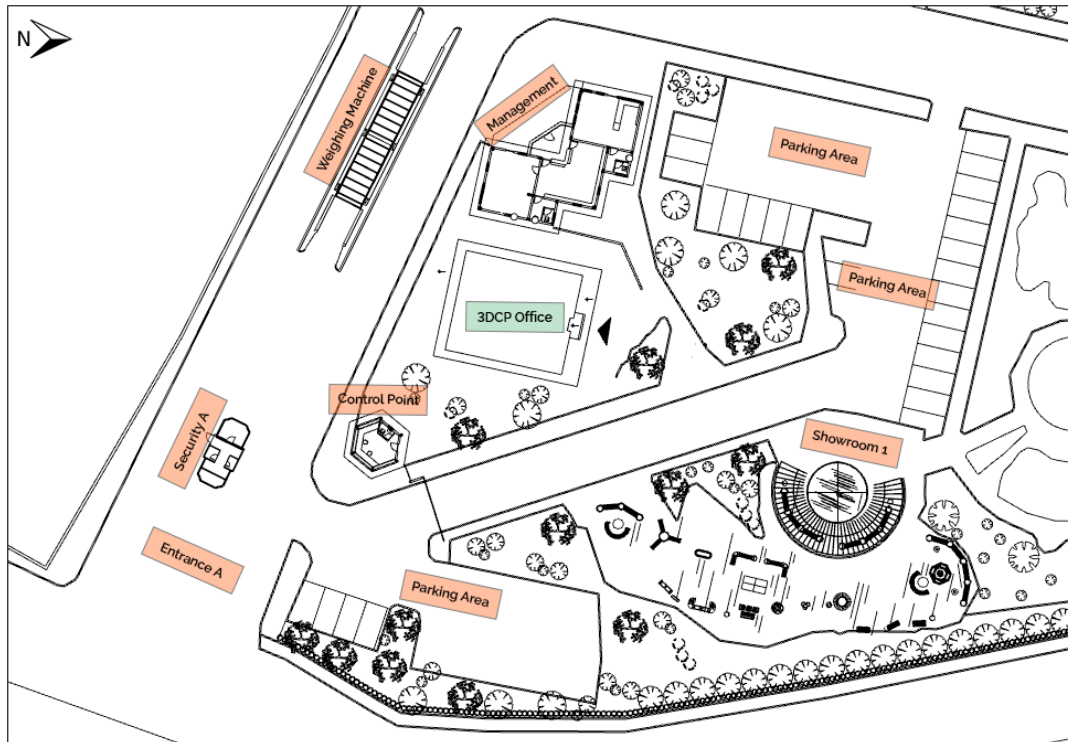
Site plan of the 3DCP office building in ISTON Tuzla facility
